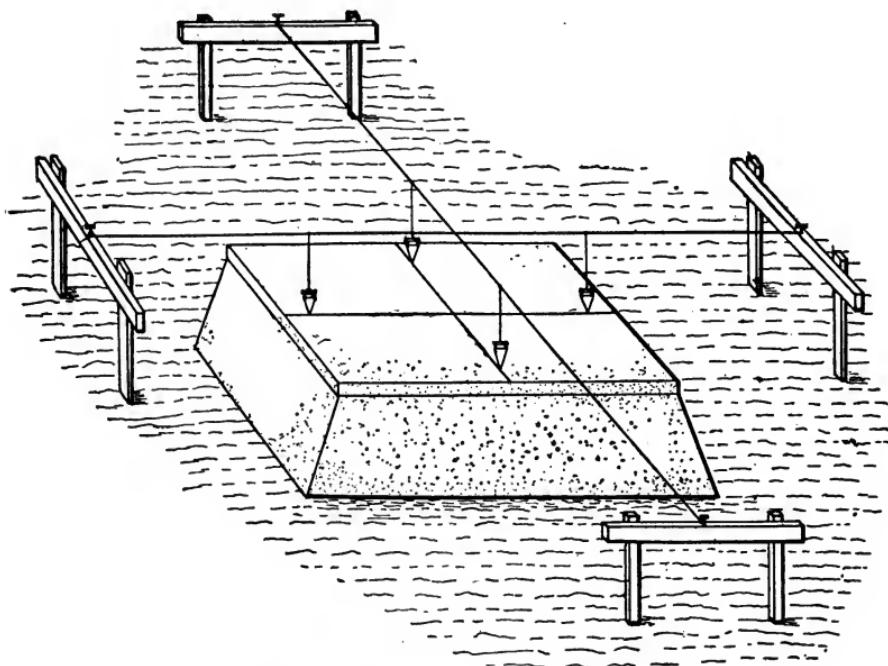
Layout for Locating Marks in Setting Foundation Shoes
